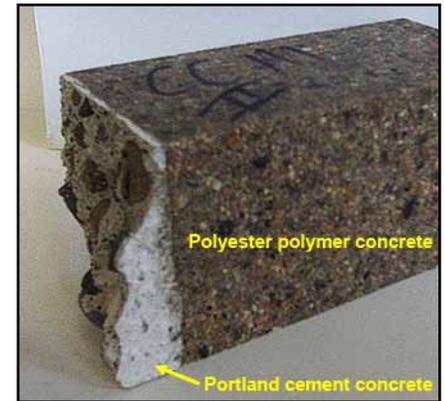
Beam failure in the cement concrete not in the polyester concrete or at the bond. California Test 551 (Shatnawi 2011).
